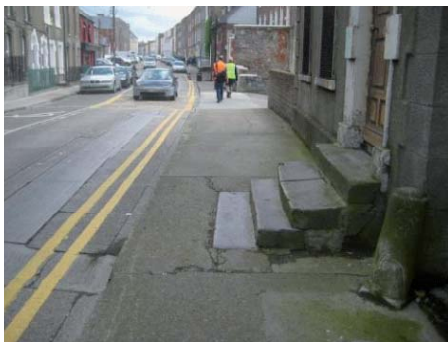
Limestone steps - these present a challenge for access along pavement and to building. Fair
